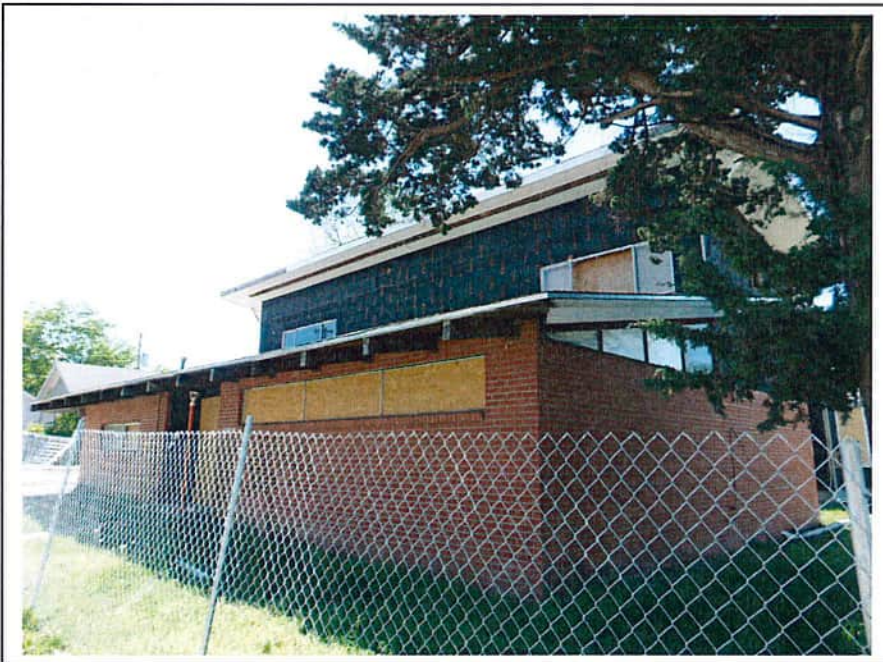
Structure on the SE corner of 4th Avenue and Ramsey Street
